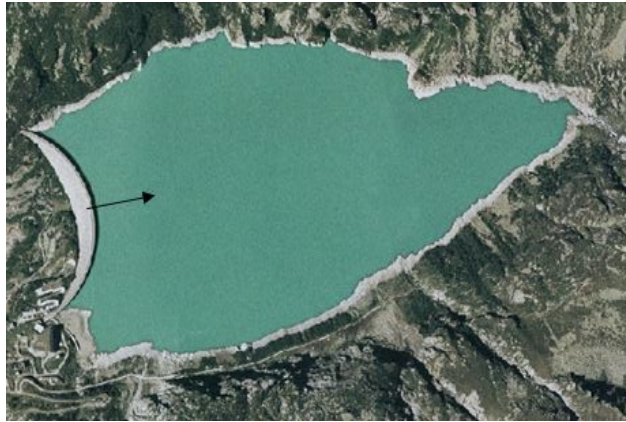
Horizontal upstream movements of a concrete arch dam.
